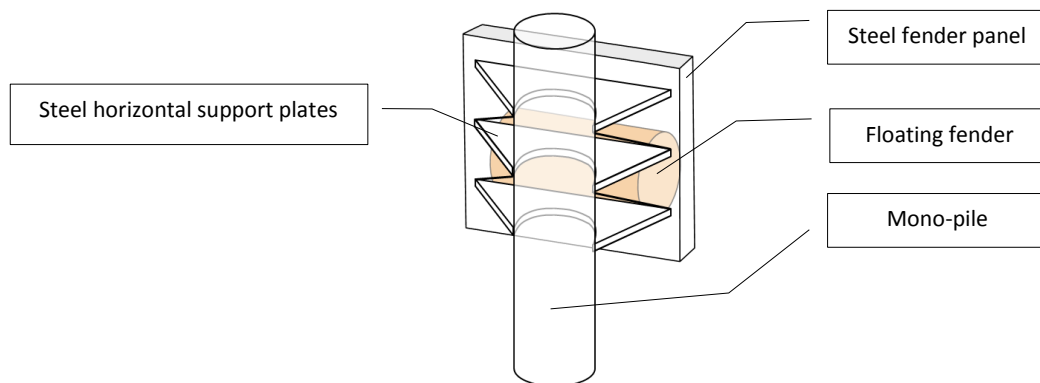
Steel fender panel connected with steel horizontal support plates to the mono-pile
